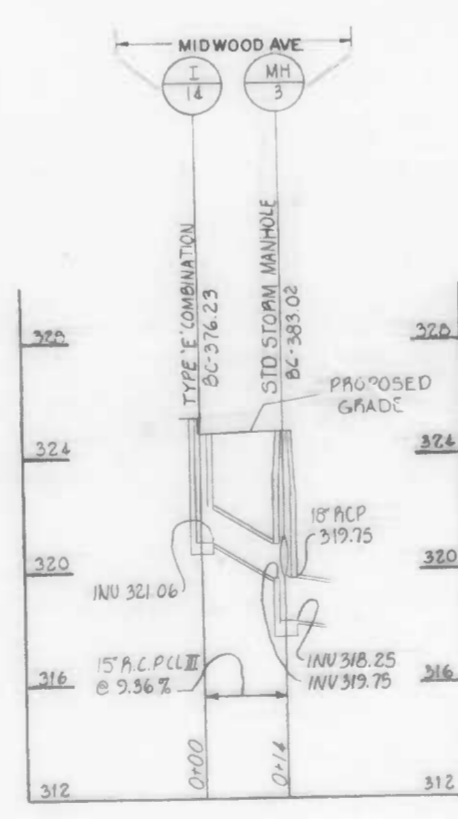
DETAIL OF ADDITIONAL DRAINAGE IN ALLEY
